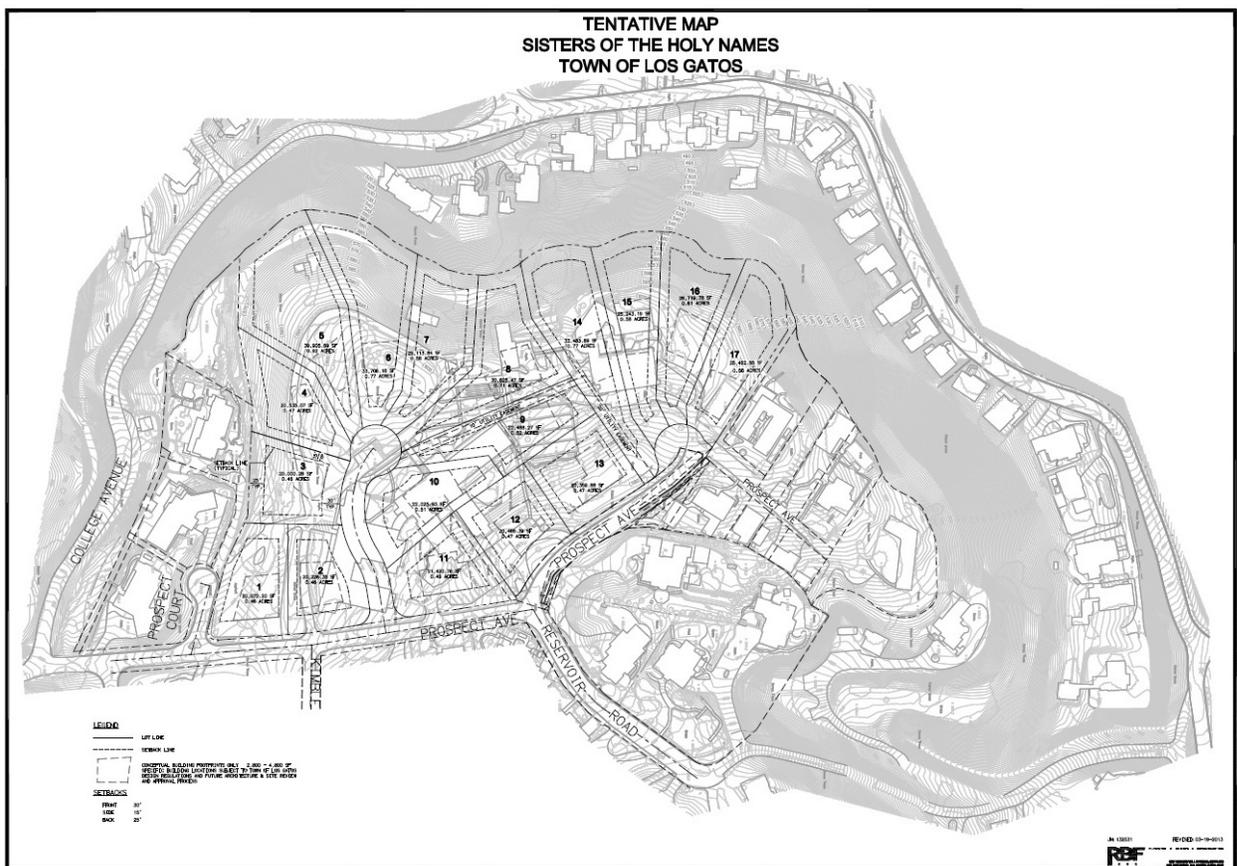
Preliminary Project Site Plan Boundaries and Lot Alignments (RBF Consulting 2/28/2013).
